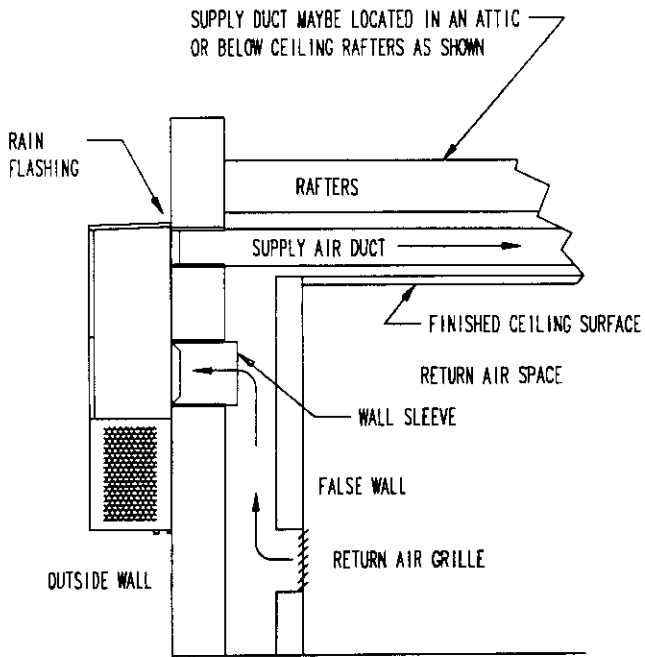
COMMON WALL-MOUNTING INSTALLATIONS
